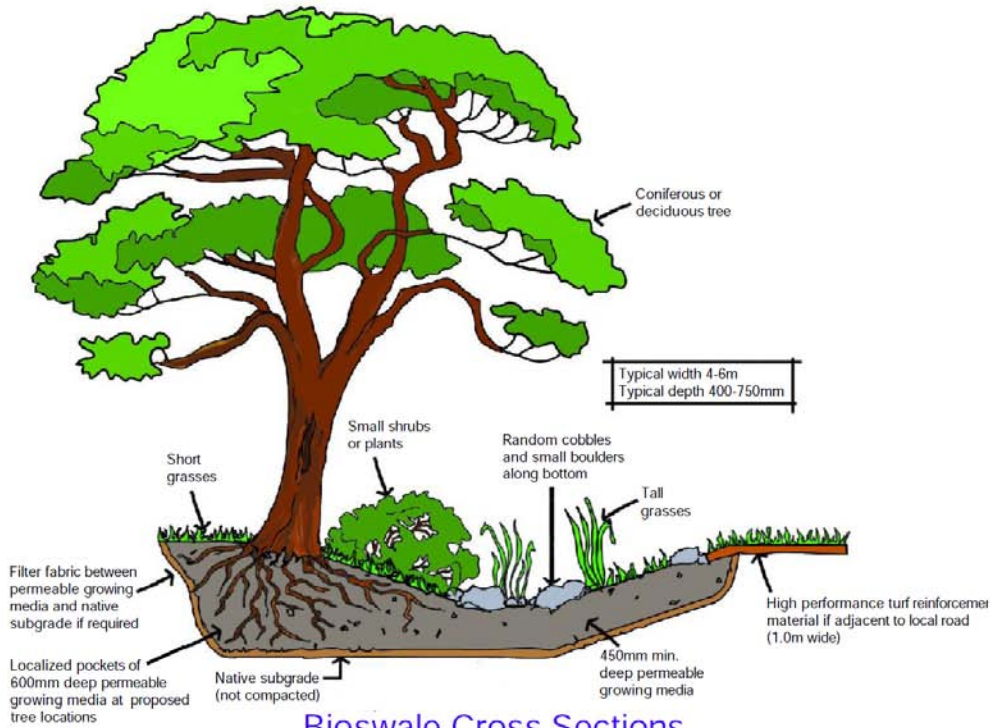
Typical Cross sections for grassed and planted bioswales
